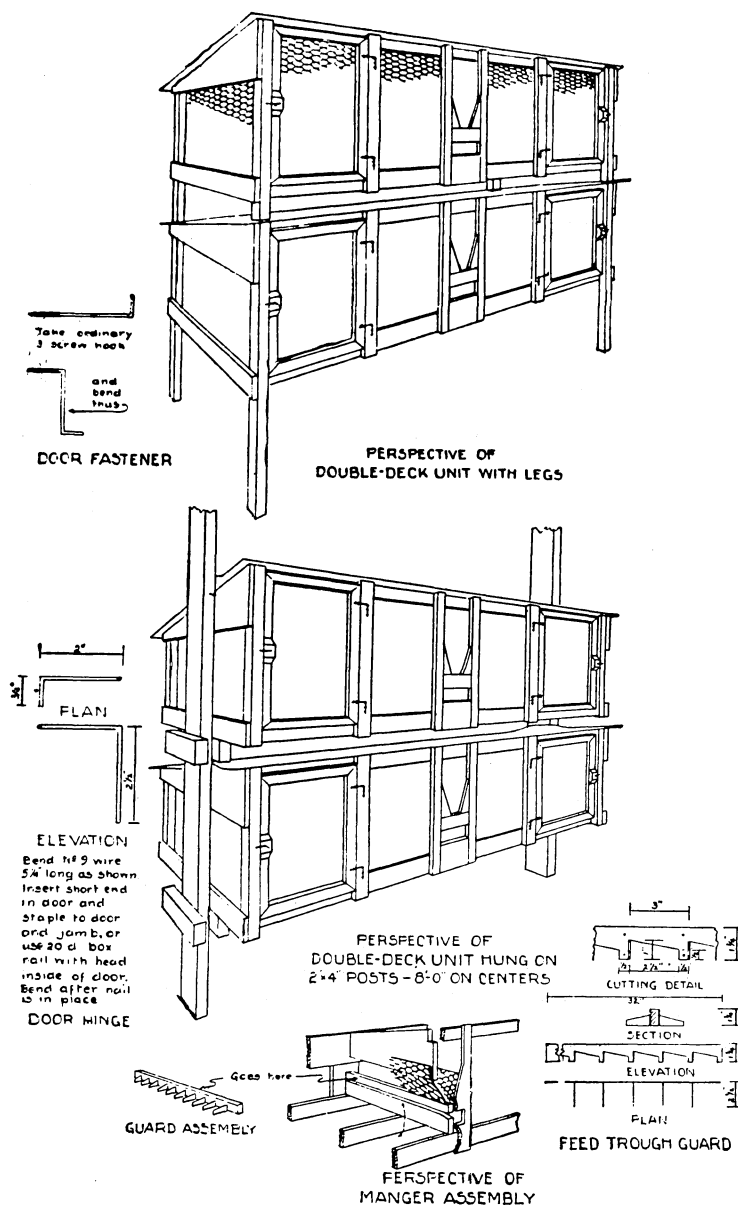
Additional construction details for a two-unit wooden-frame wire hutch, including manner of hanging two tiers of hutches.
